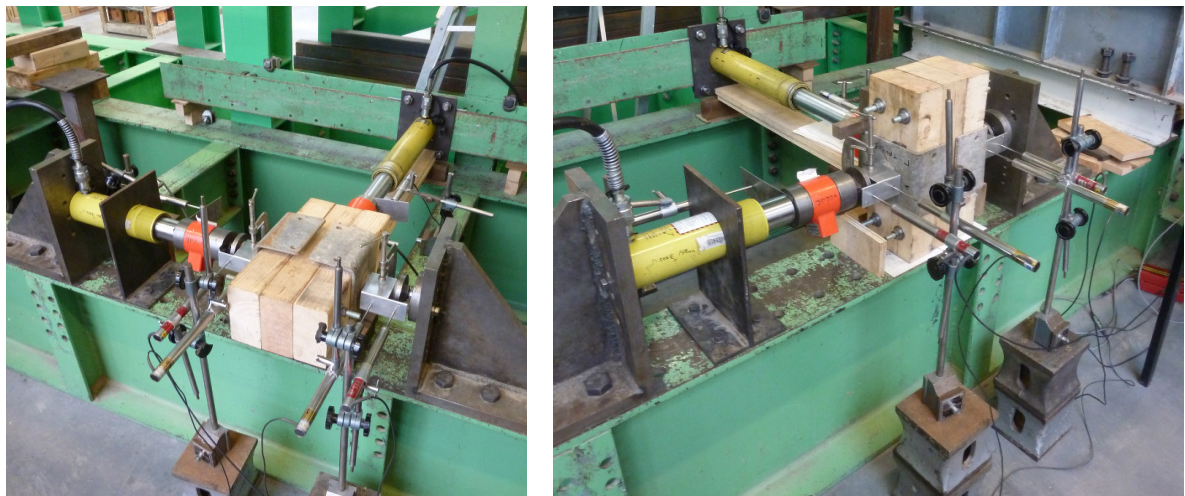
Test setup: Bending about axis 1 (Left), bending about axis 2 (Right).
